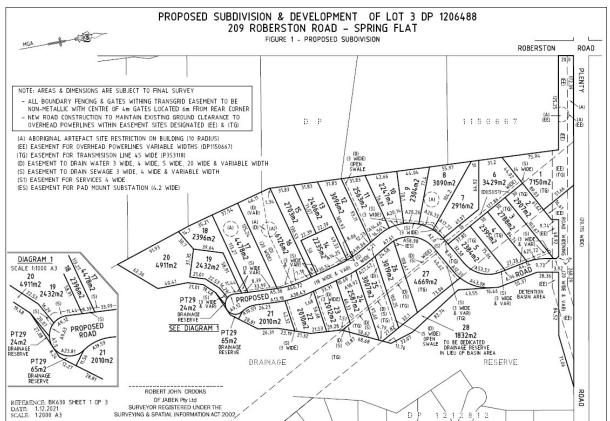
Proposed Subdivision Plan – Addition of Lots 14 and 19
